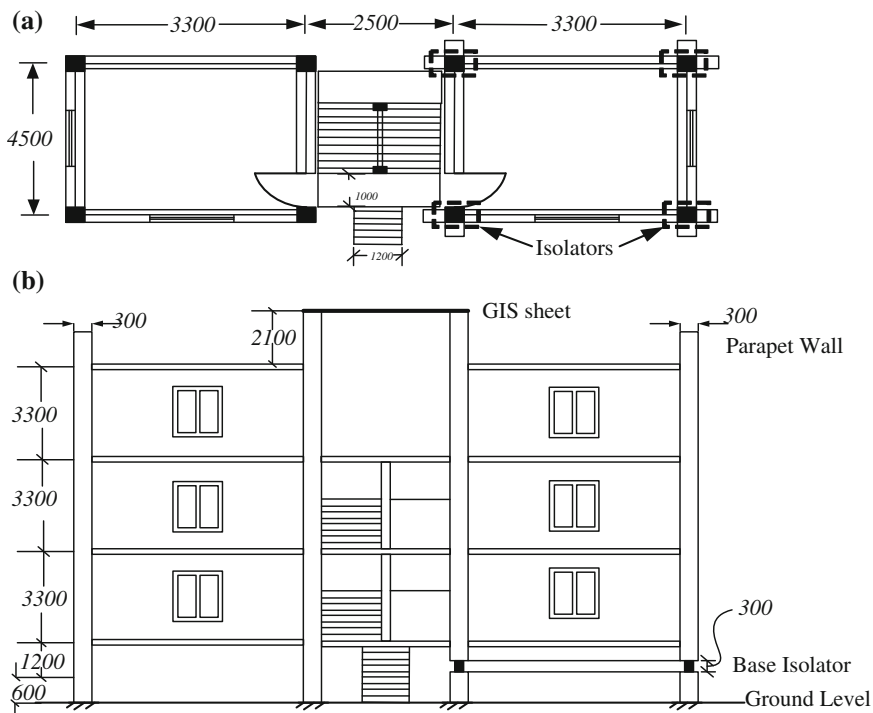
a Plan of fixed-base and base-isolated RCC building showing the position of isolators, b front elevation of the building (all the dimensions are in millimeter)
